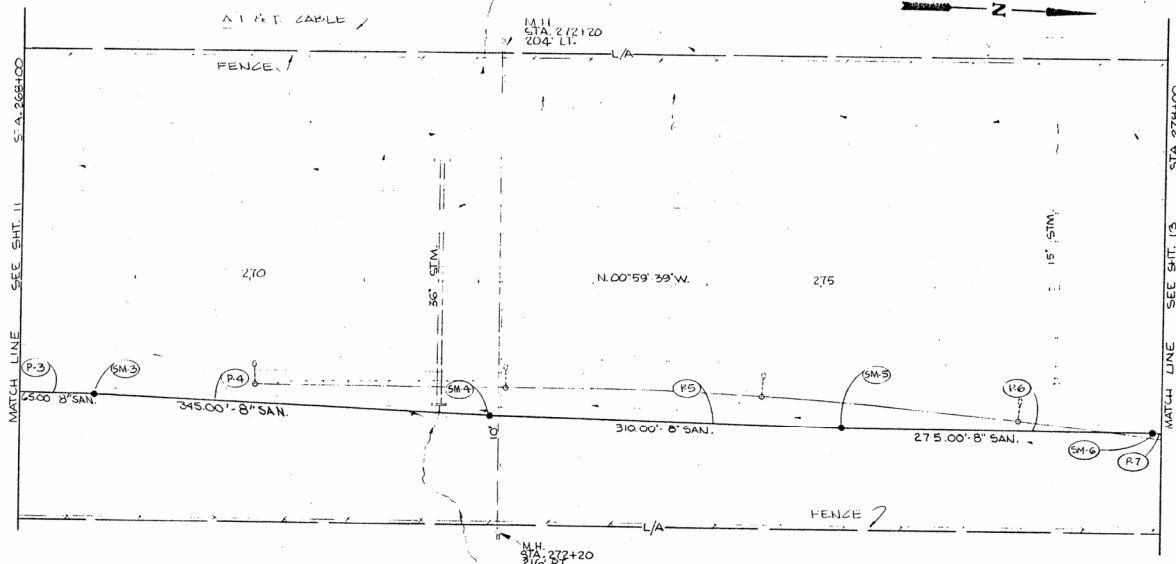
SINGLE PLAN AND CROSS SECTION-FULL LINE
